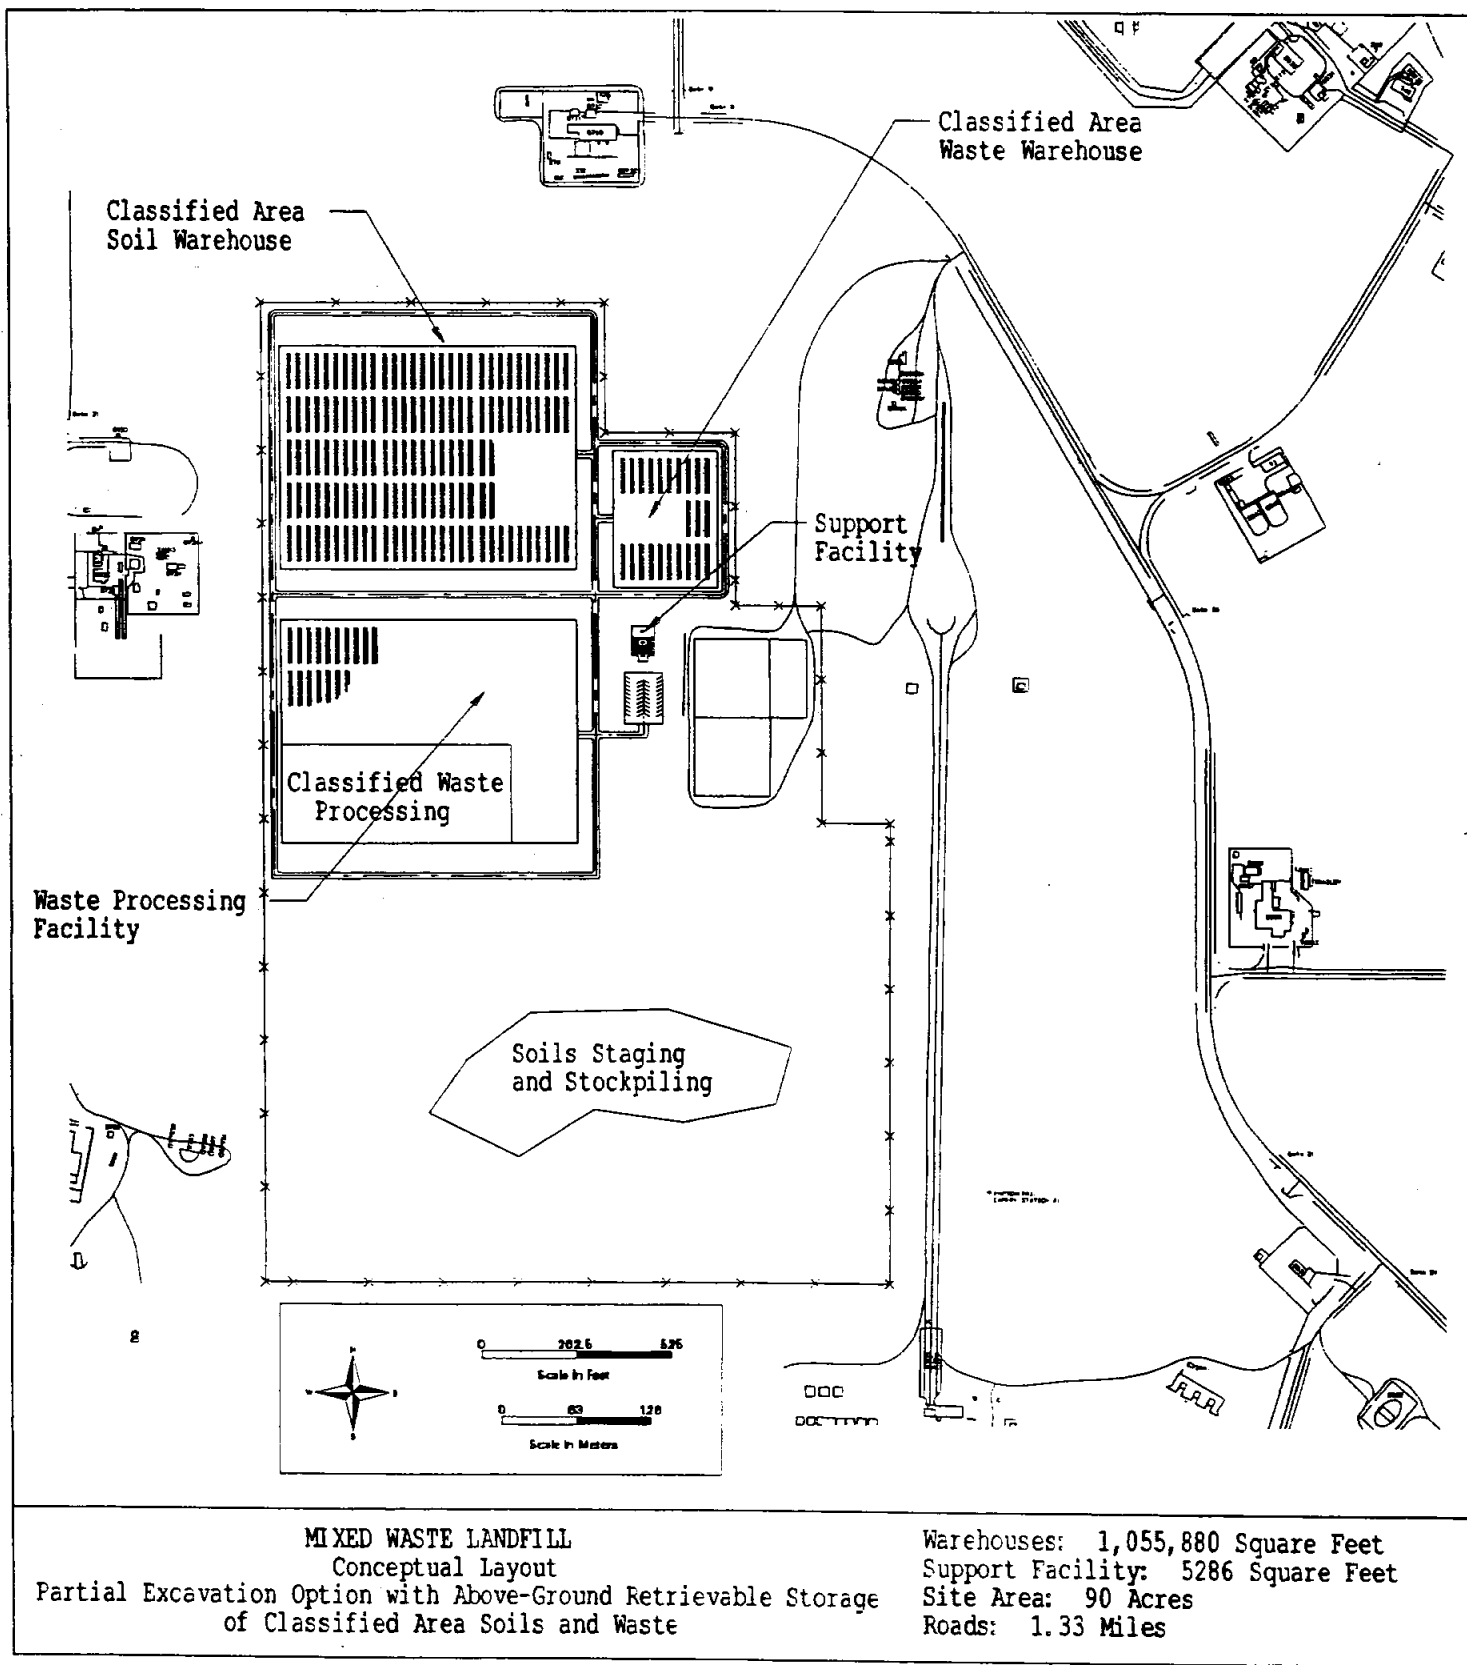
Partial Excavation with Aboveground Retrievable Storage
